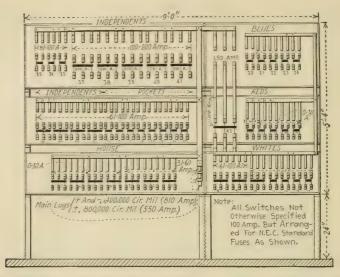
Rear view of interlocking, dead-front, manually operated stage switch-board showing dimensions, fuse and switch sizes. (Manufactured by *The Pringle Electrical Mfg. Co.* for the Hippodrome Theatre, Buffalo, N. Y.)
